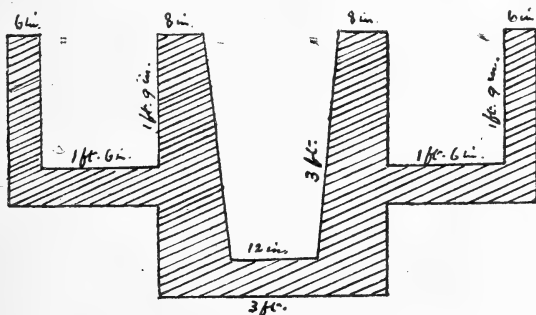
Cross-section through bath and manholes: bath in centre, and manhole on either side.
